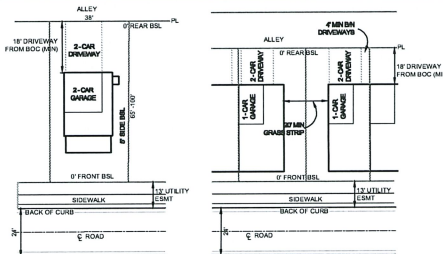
Exhibit G: Revised Site Plan Presented at the 6/7/2022 Planning Commission Public Hearing
